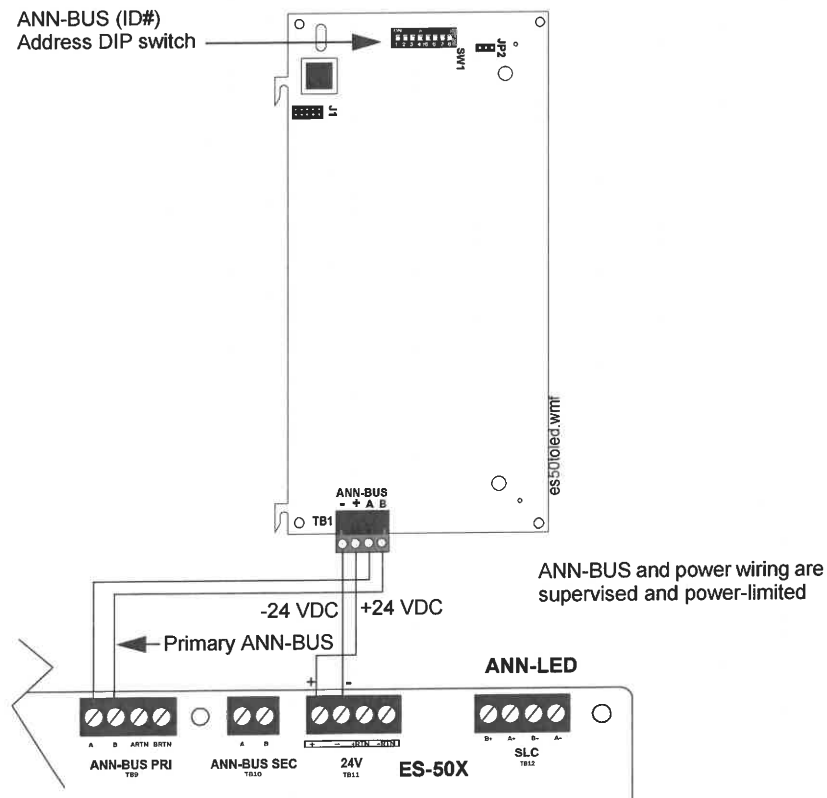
ANN-LED Board Layout and Connection to FACP
